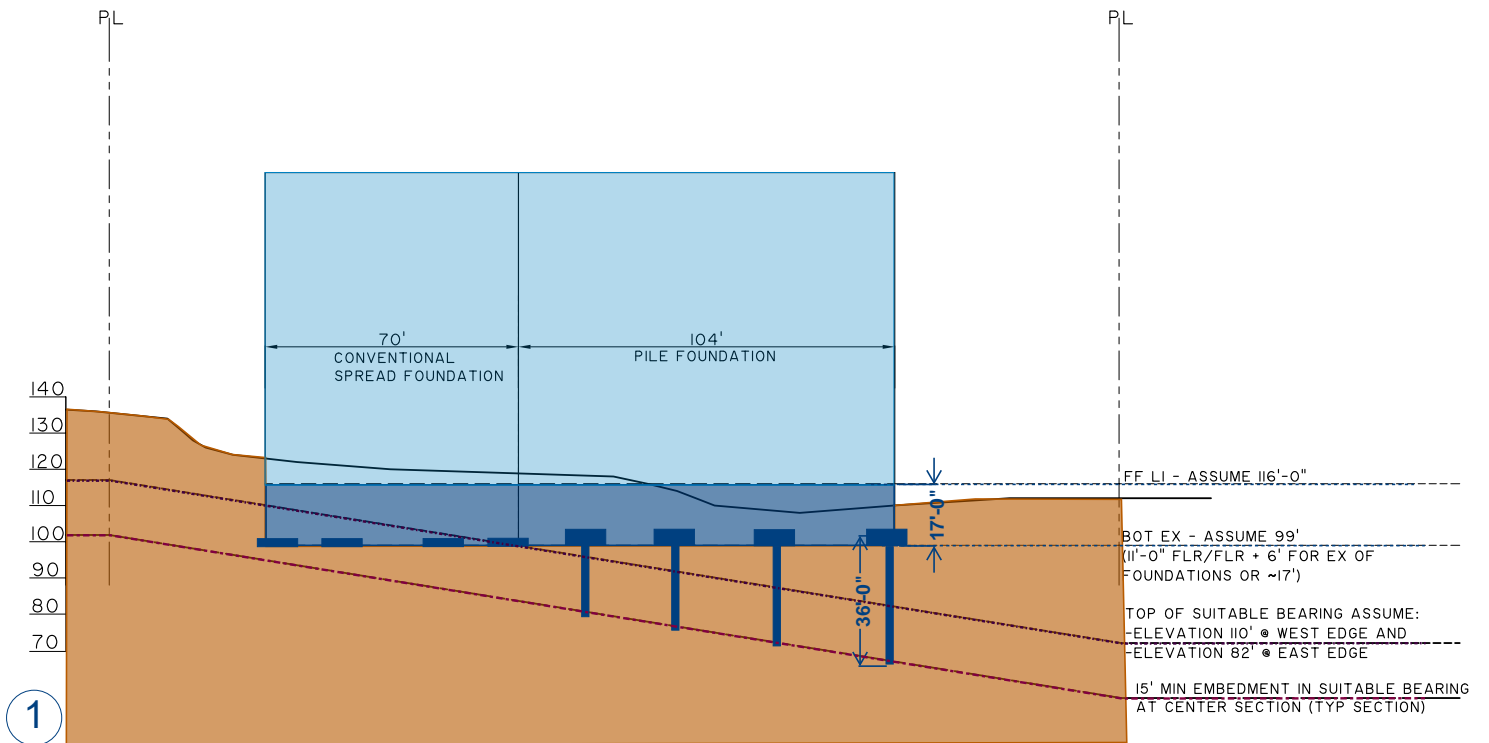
SPUDS Concept 2, Section 1 Through North Building Excavation, Looking North
